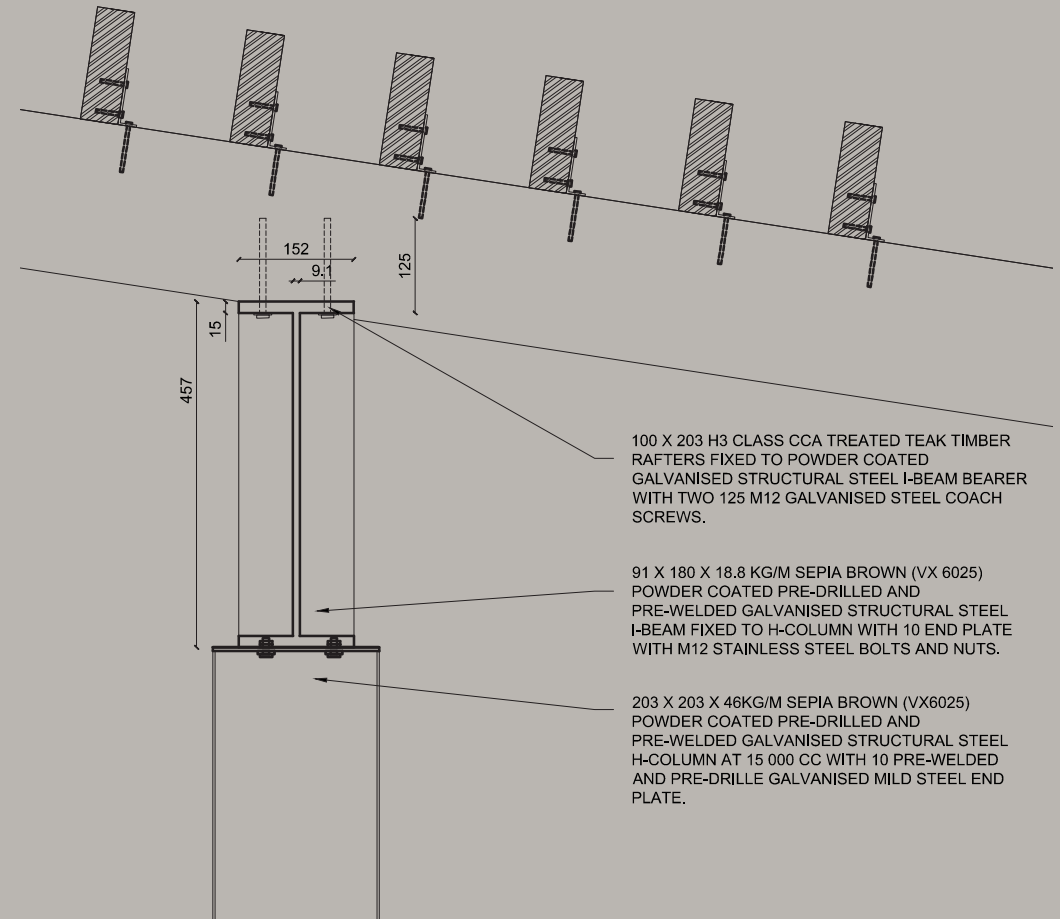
Detail Section (1:10) of Overhead I-Beam and Timber Planks Fixings (Author, 2014).
